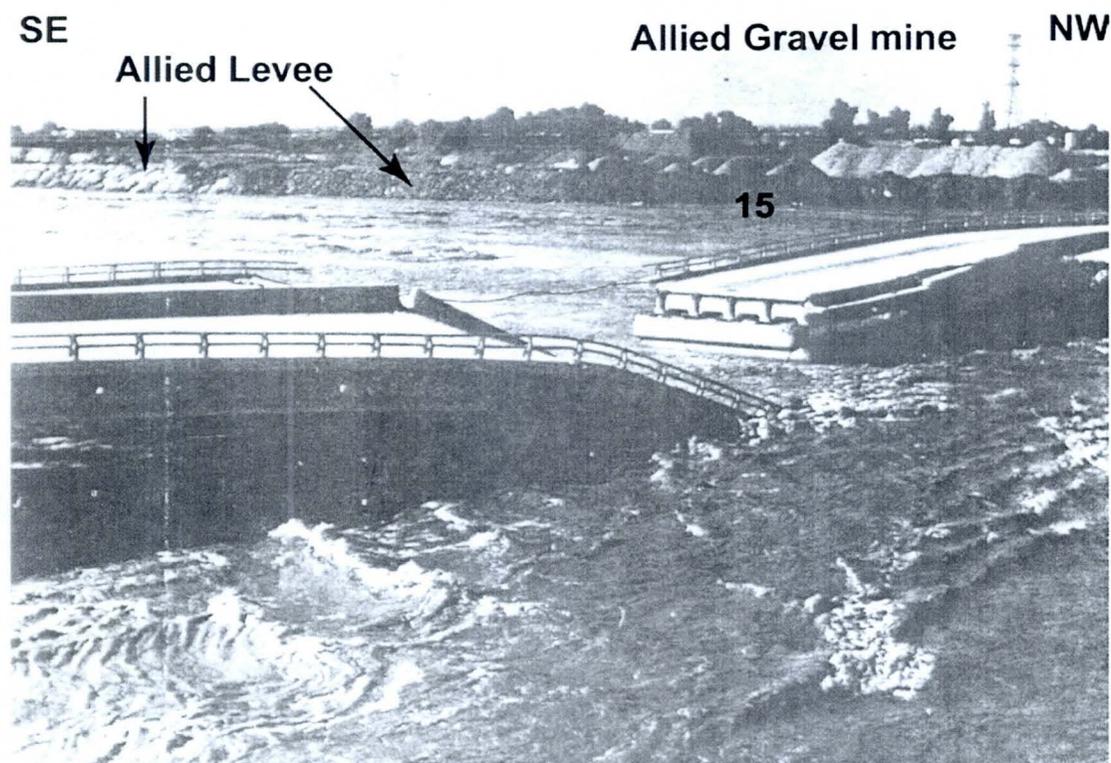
Photograph looking downstream at the Indian School Bridge collapse during the 1980 flood.
